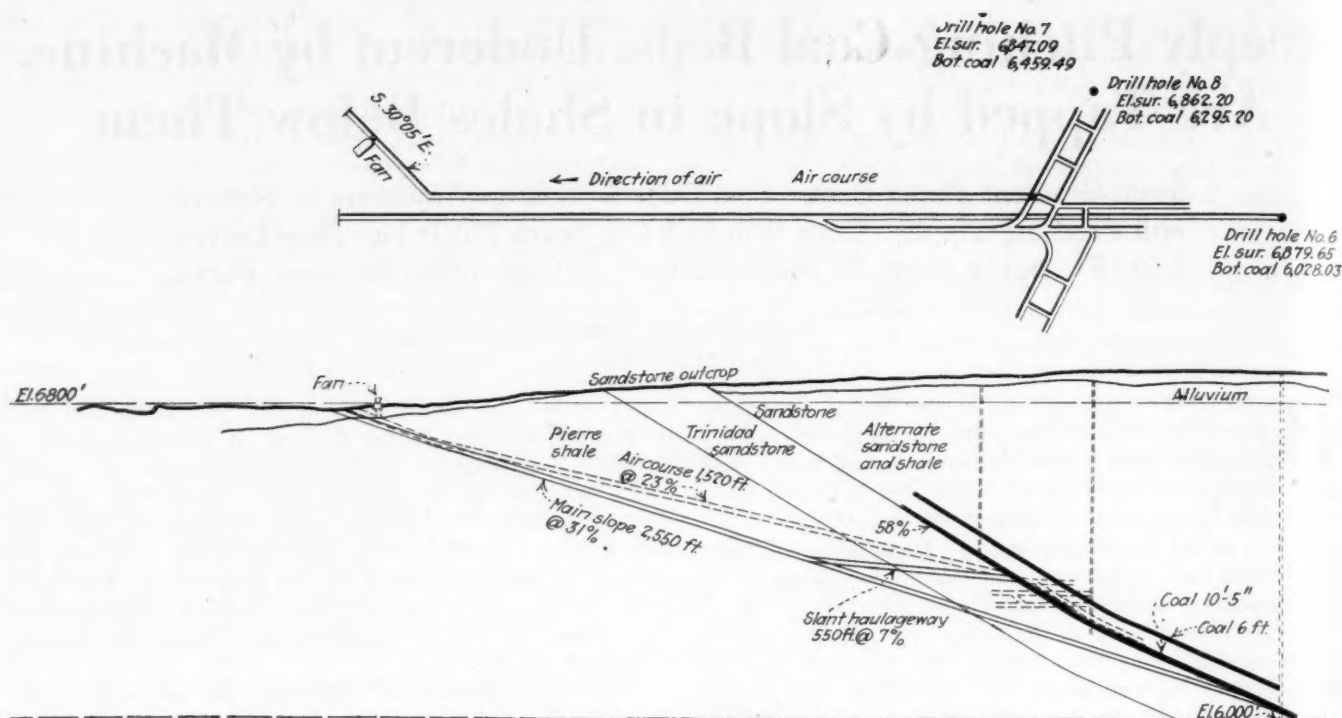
Plan and Elevation of the Rock Slope, Slant and Coal Workings
